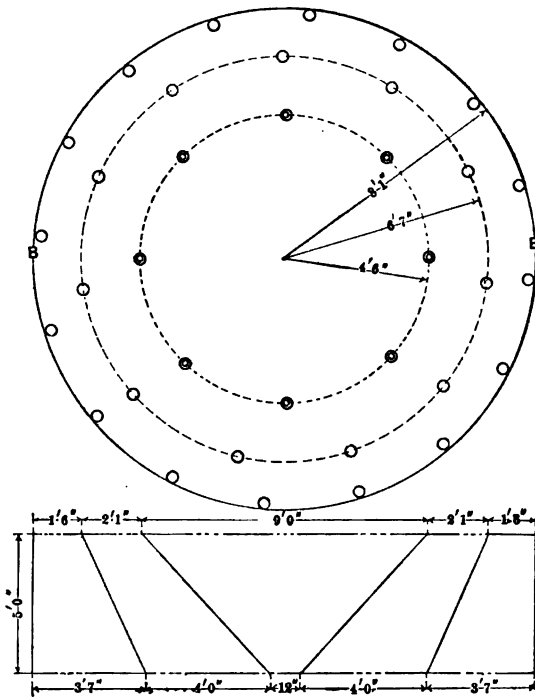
Arrangement of Drill Holes as Used for Sinking Shaft 22.
